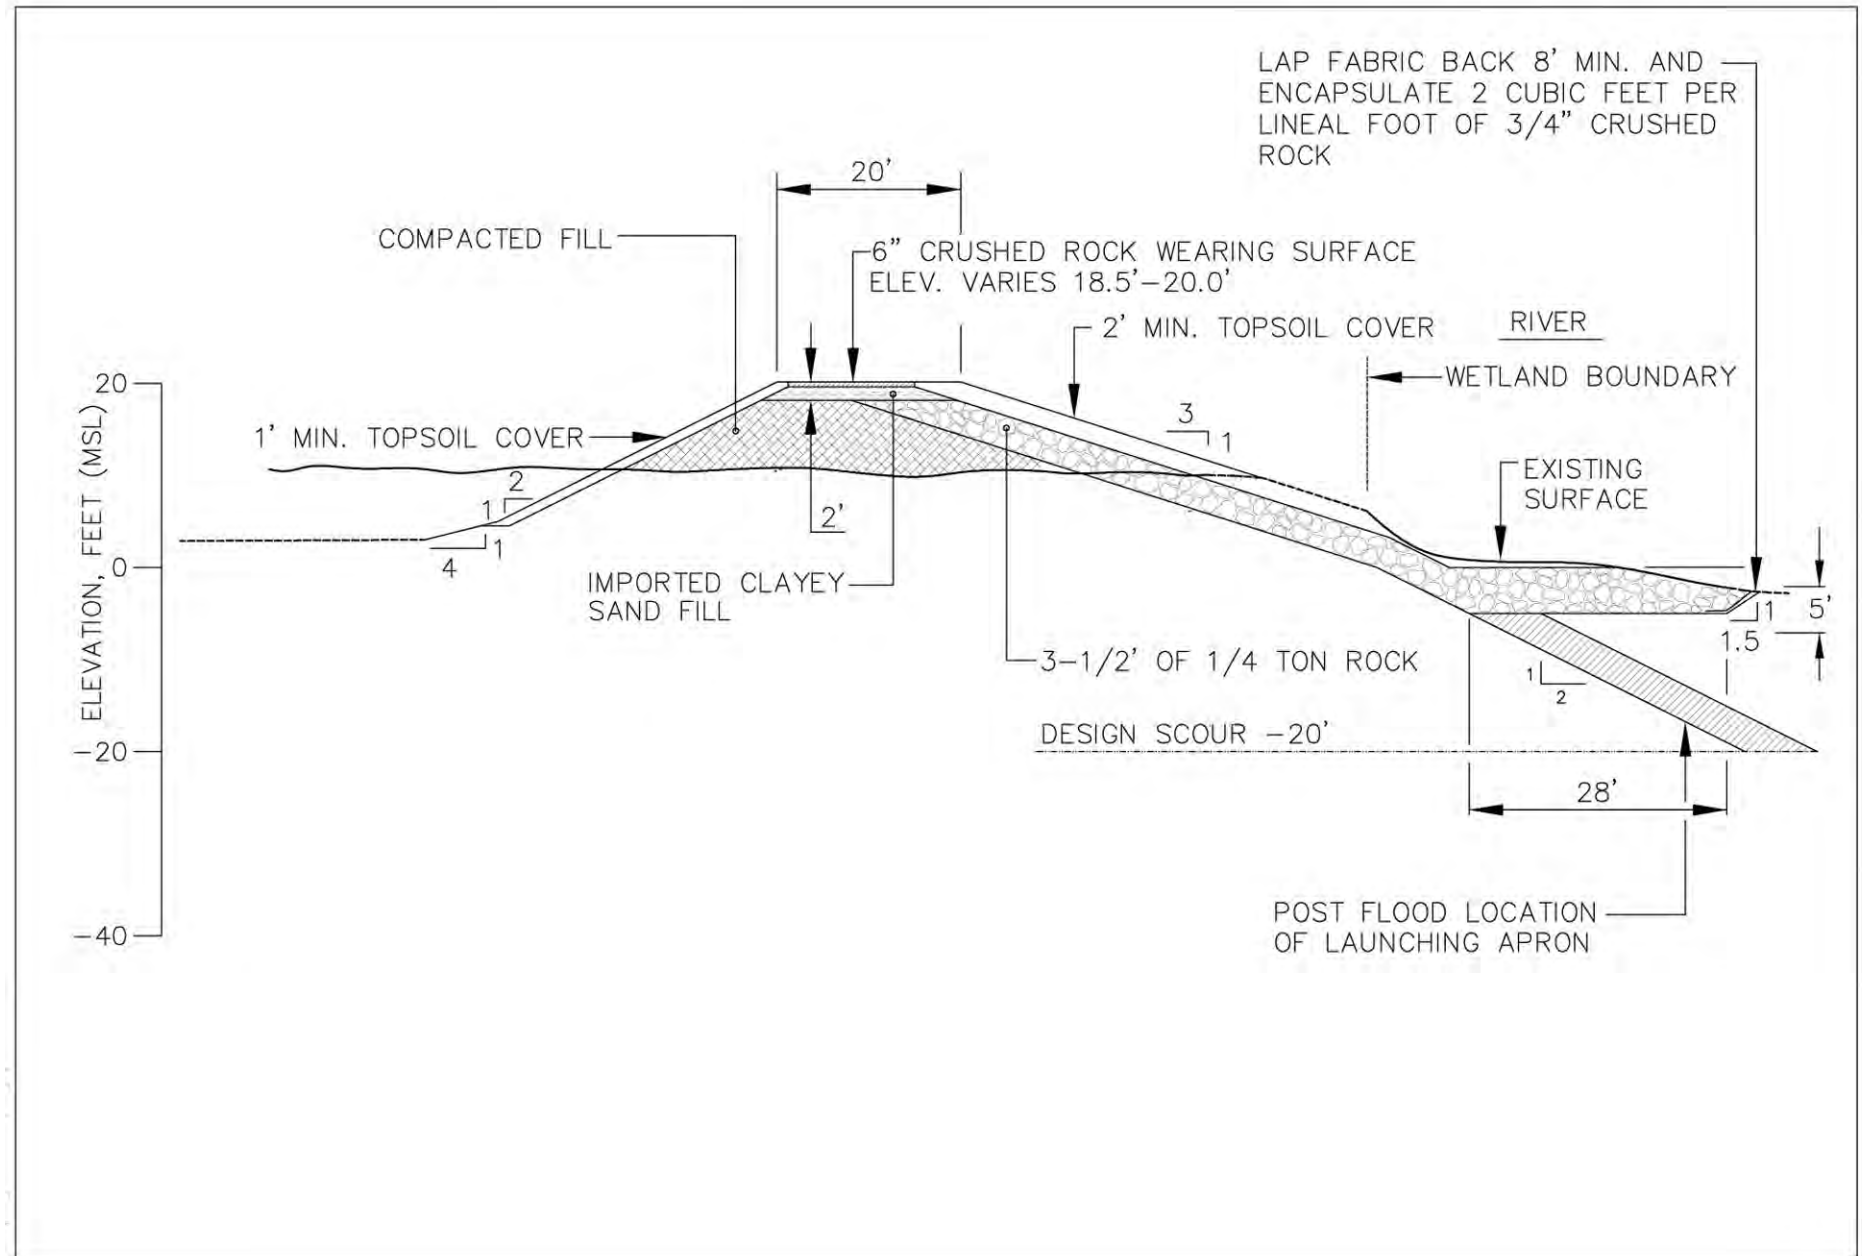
Typical Section of Slope Protection Stone Revetment No. 2
